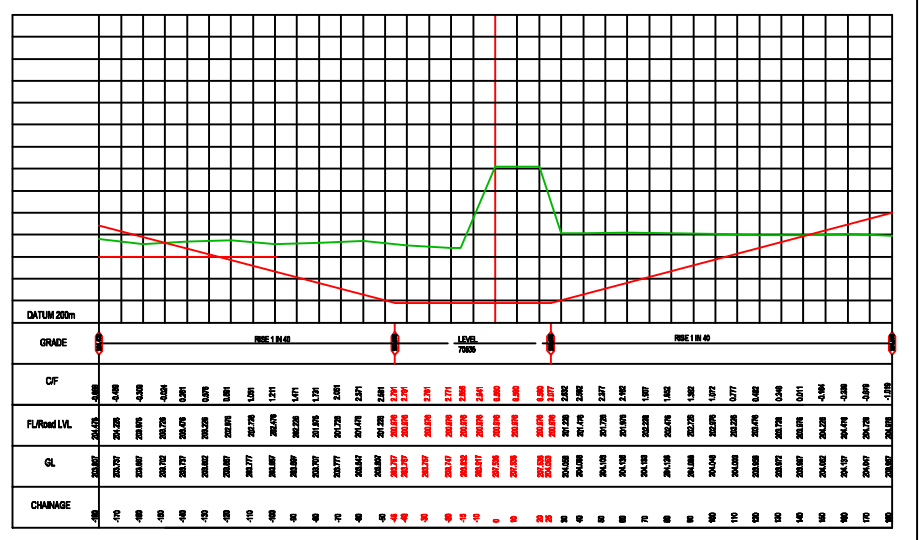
DETAILS OF STRUCTURES OVER APPROACH SECTION - C-C
